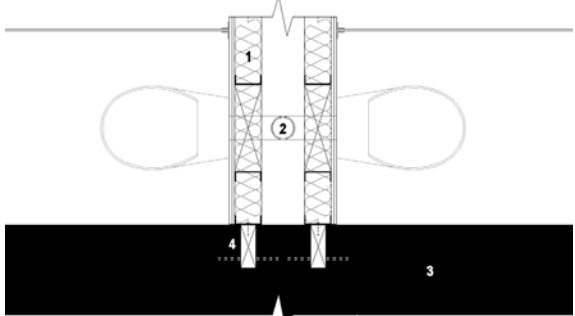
Connection detail with gypsum wall. (1) gypsum wall; (2) sewer pipe; (3) poured earth wall; (4) nailing strip
